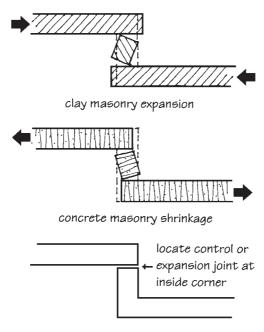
Movement at offsets in parallel walls requires placement of control or expansion joints to prevent cracking.
